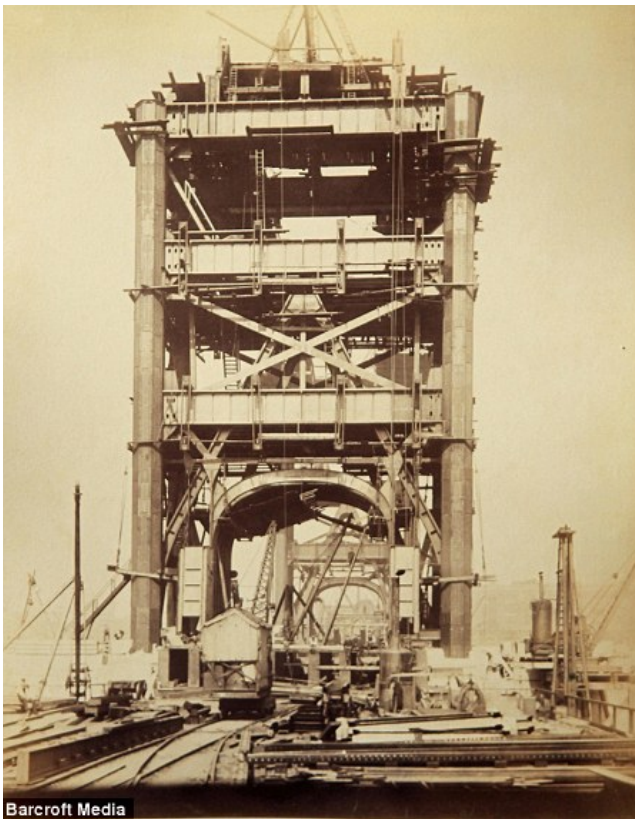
A view of the bridge: The sturdy steel frame of Tower Bridge can be seen, before it was covered with its distinctive stone-cladding on the orders of architect John Wolfe-Barry
